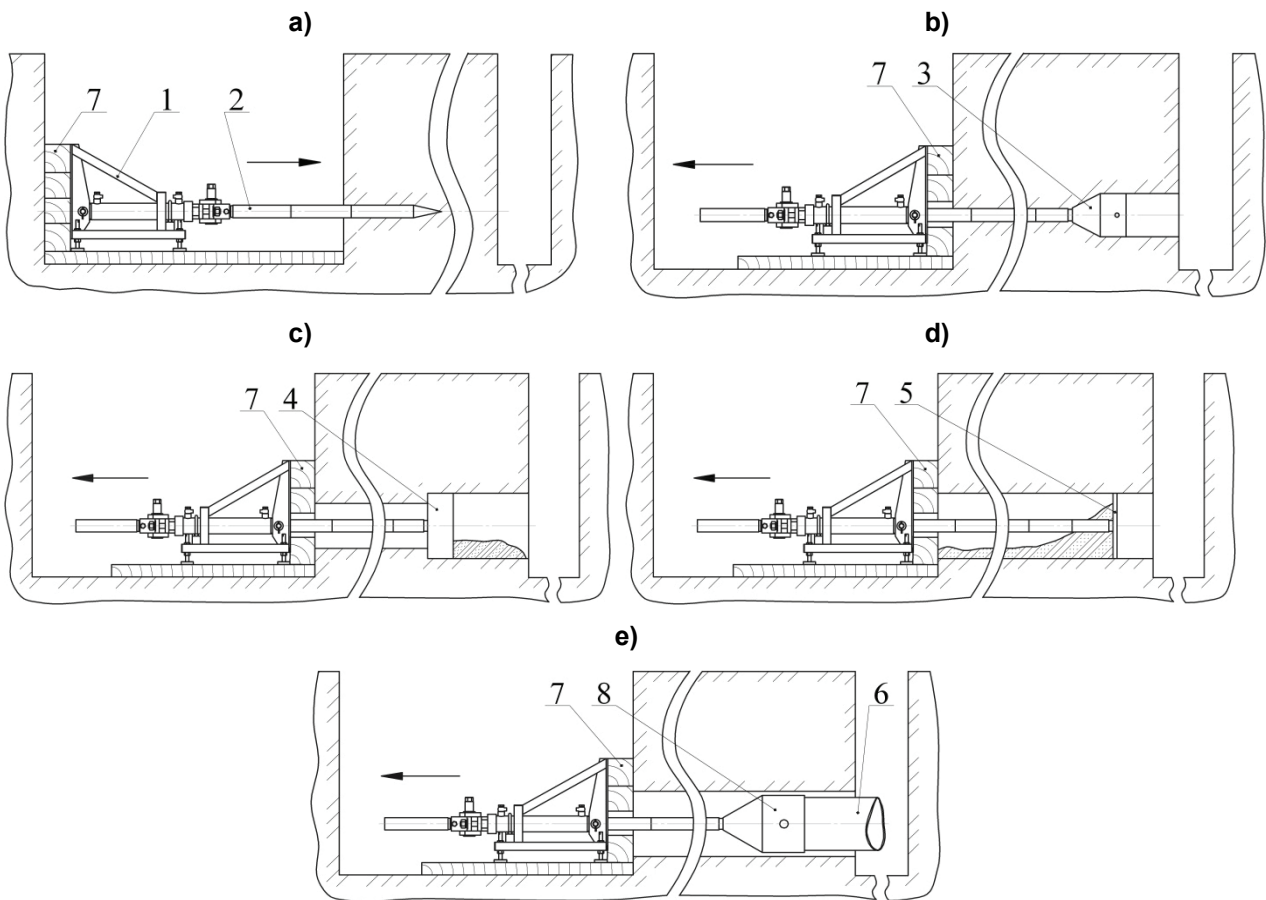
The well development by the combined method: a – pilot thrust boring; b – well expansion with the expander; c – well expansion with the cutting ring; d – well cleaning; e – drawing the protective case in the well; 1 – thrust boring plant; 2 – rod; 3 – conic expander; 4 – cutting ring; 5 – cleaning disk; 6 – protective case; 7 – resistant bars; 8 – pipe holder
